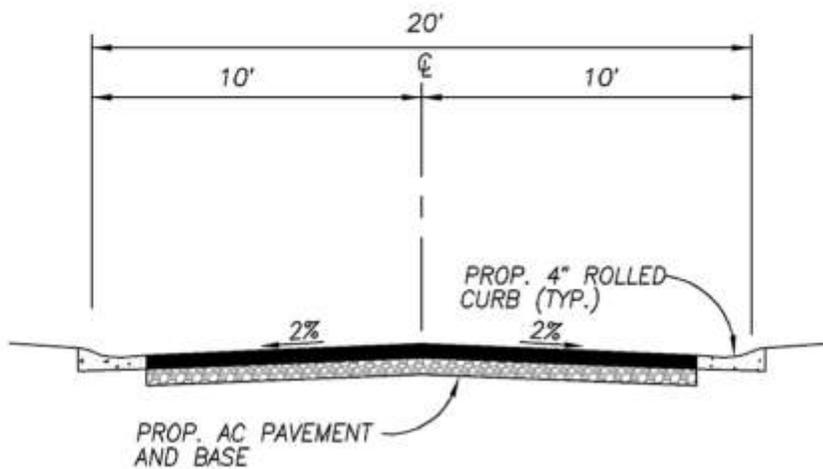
c, Street Sections - FC-2 Local Streets and Drives
